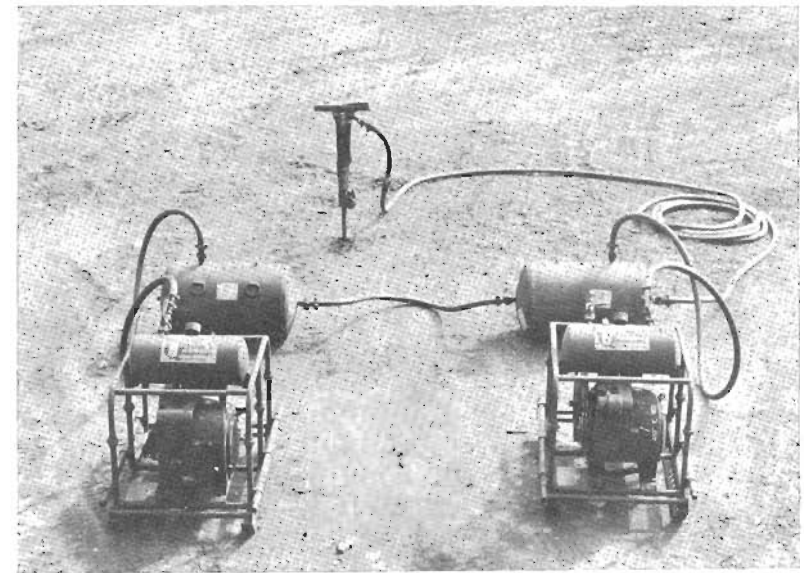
Portable air compressors (20 c.f.m.), receiver tank, and jack hammer. Used to facilitate sill and deadman excavation.
